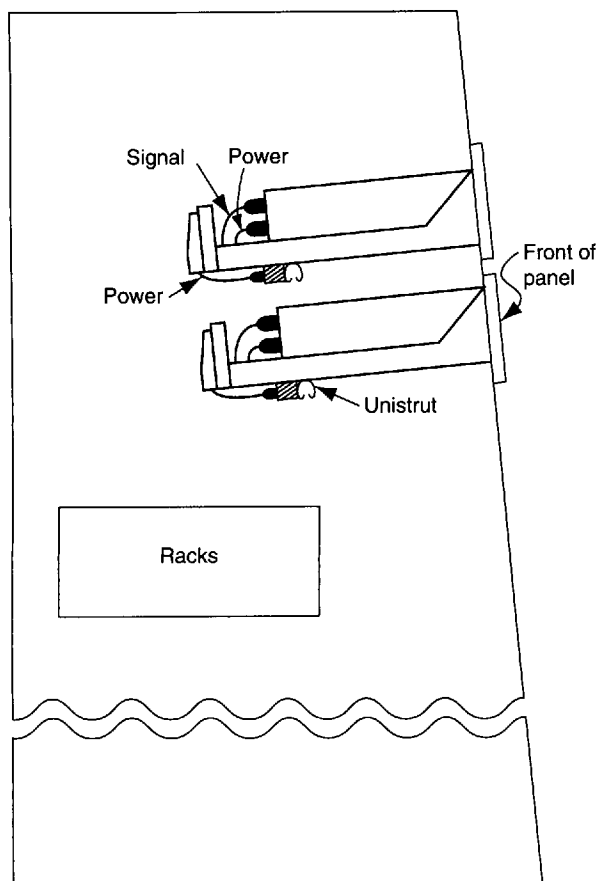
Panelboard Wiring Terminating Field Wiring at Instruments
